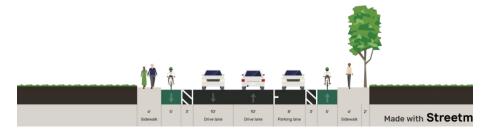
Segment 3 Proposed Cross Section on Centre Avenue from Allequippa Street to Herron Avenue (looking west)
